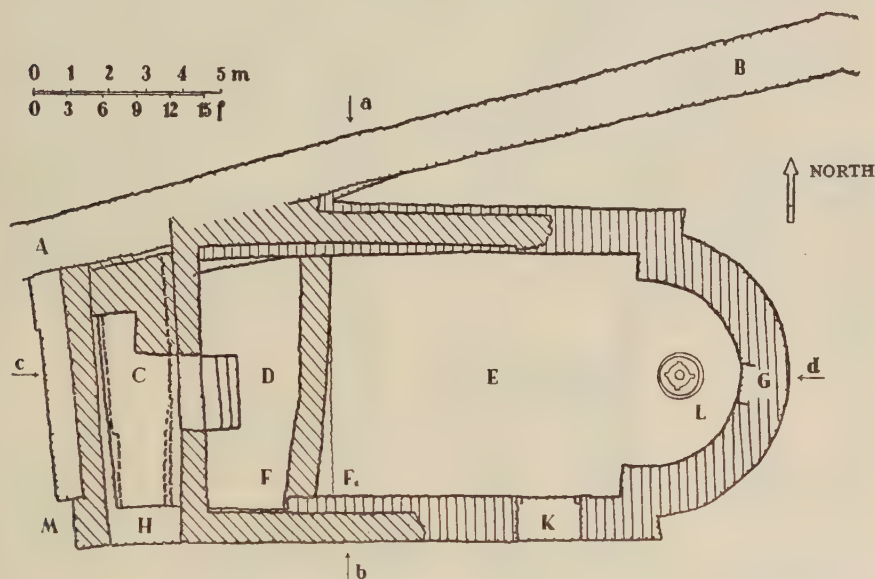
GROUND-PLAN OF CHURCH, 1:200
